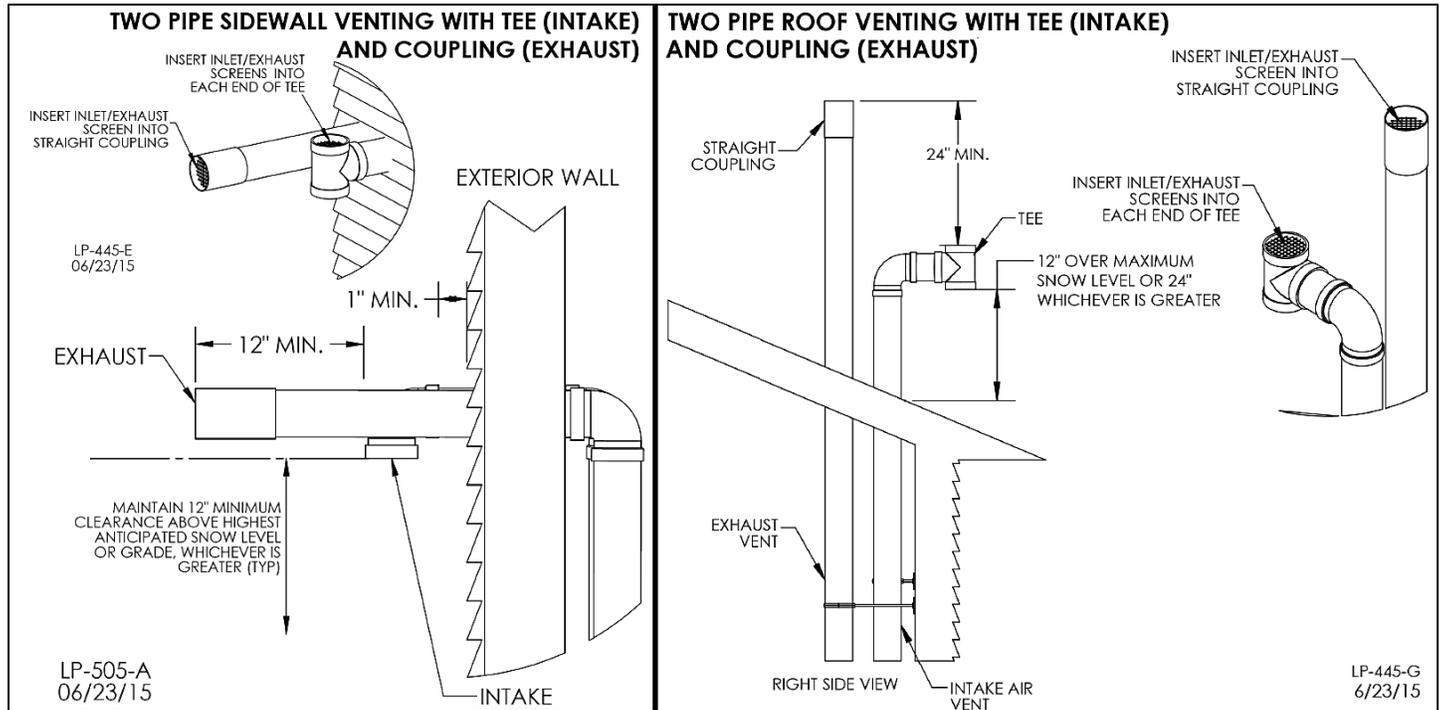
Direct Vent, Roof and Sidewall Vent Terminations
